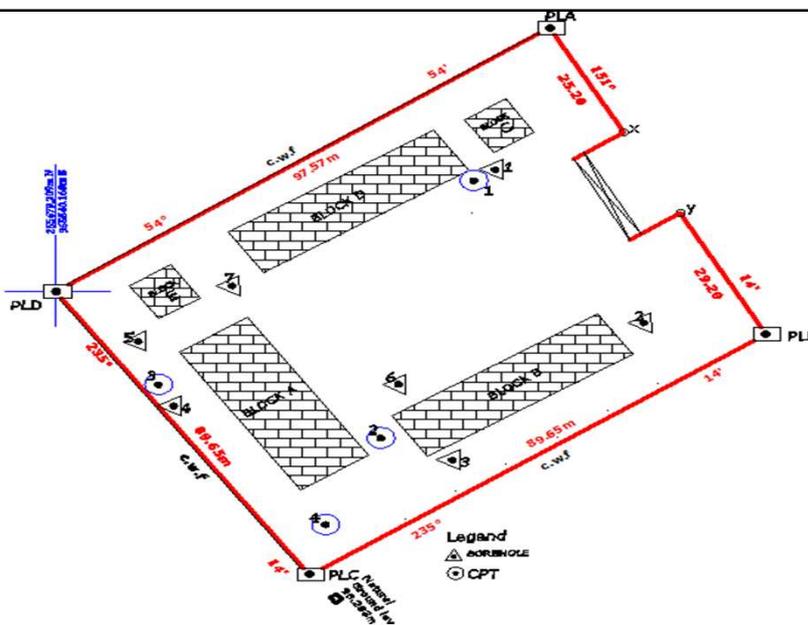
LAYOUT OF BUILDINGS IN SCHOOL
